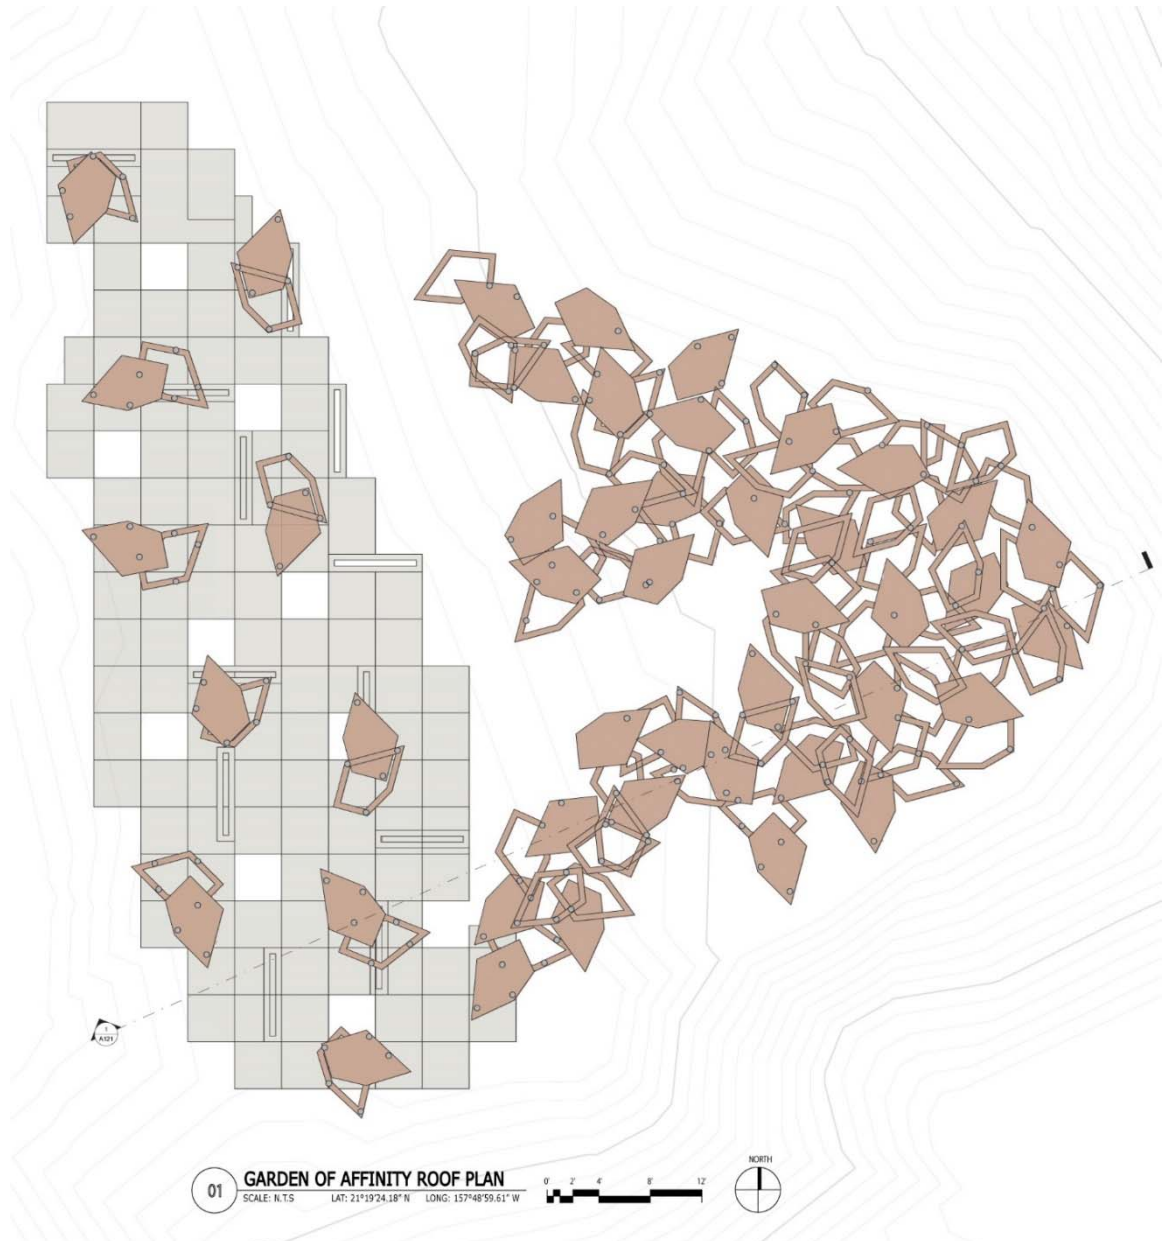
Garden of Affinity Roof Plan. Made by Author.
